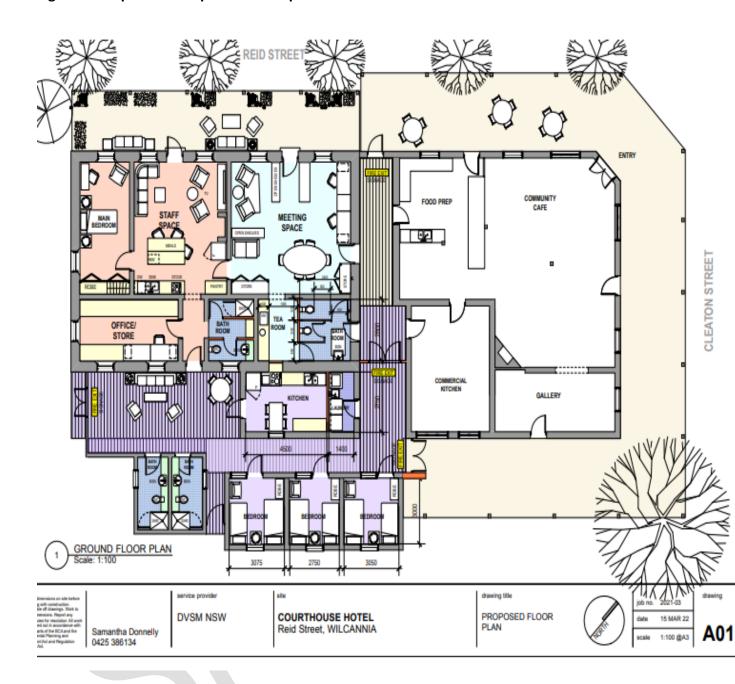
Proposed floor plan and site plan of 65-67 Reid St Wilcannia
